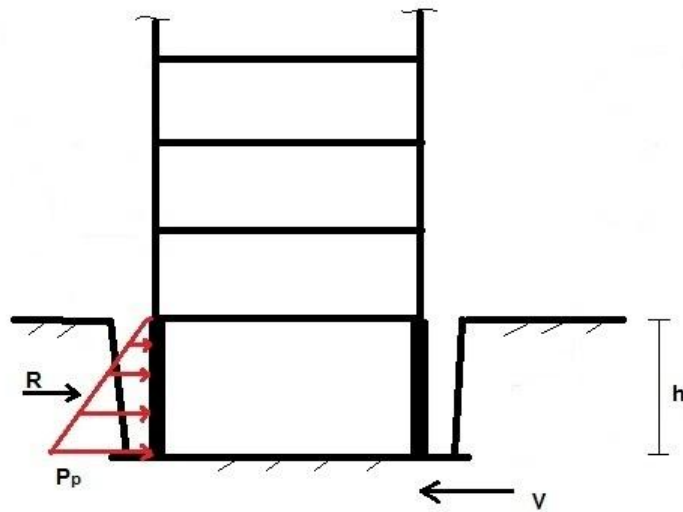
13. Concrete wall and soil force resistance against earthquake shear force
